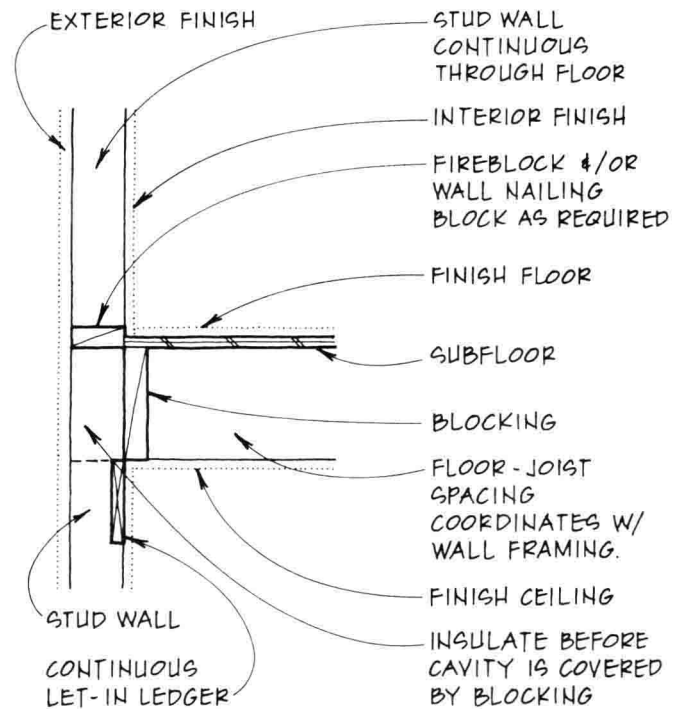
The balloon frame is characterized by the use of long continuous studs and a ribbon or ledger to support second floor joists.
